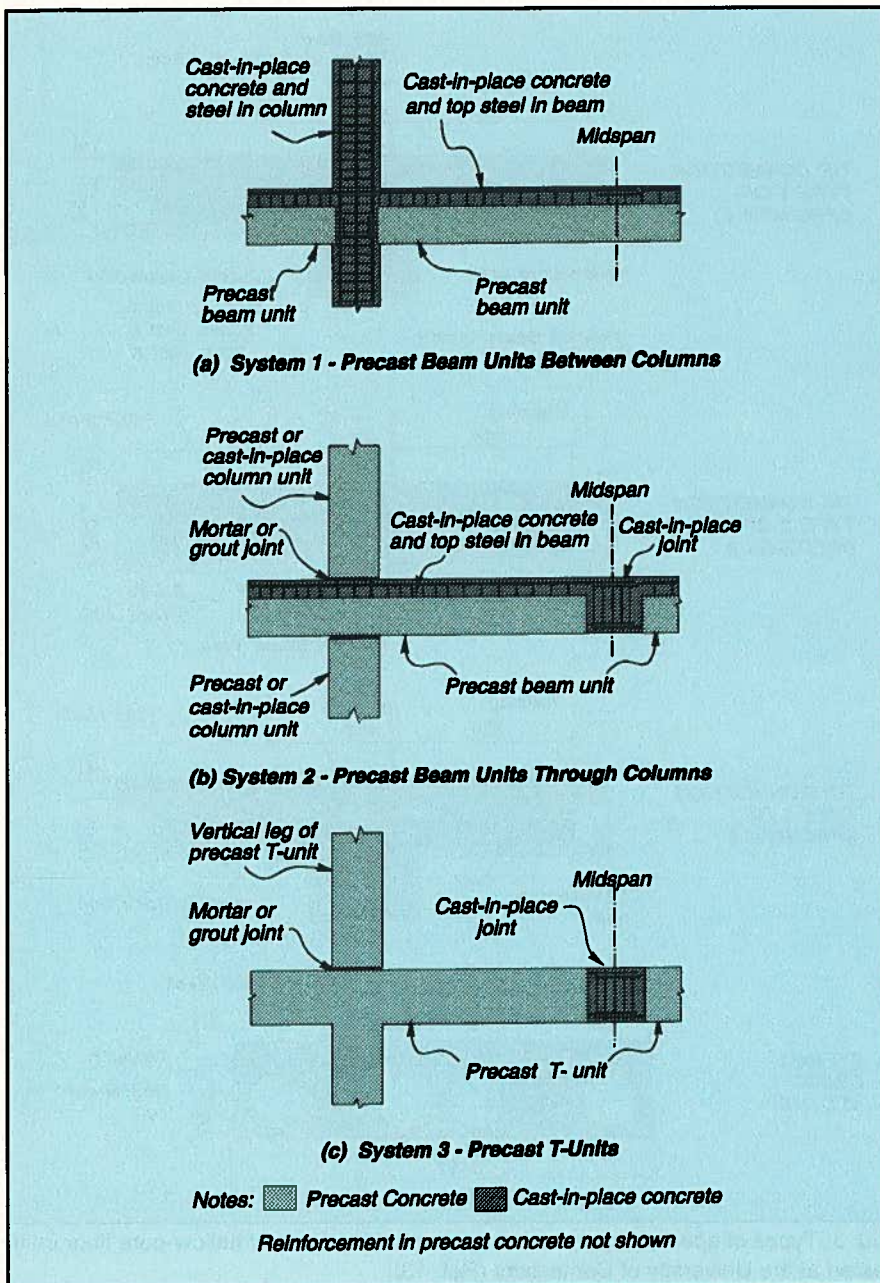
Arrangements of precast concrete members and cast-in-place concrete for constructing reinforced concrete moment resisting frames (Refs. 14 and 15).
